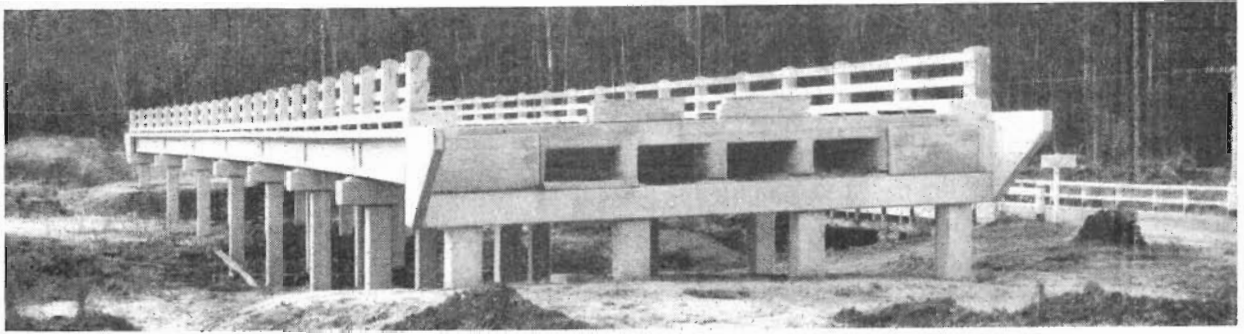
Princes Highway East. New bridge over Blue Nose Creek. West of Cann River Township.
